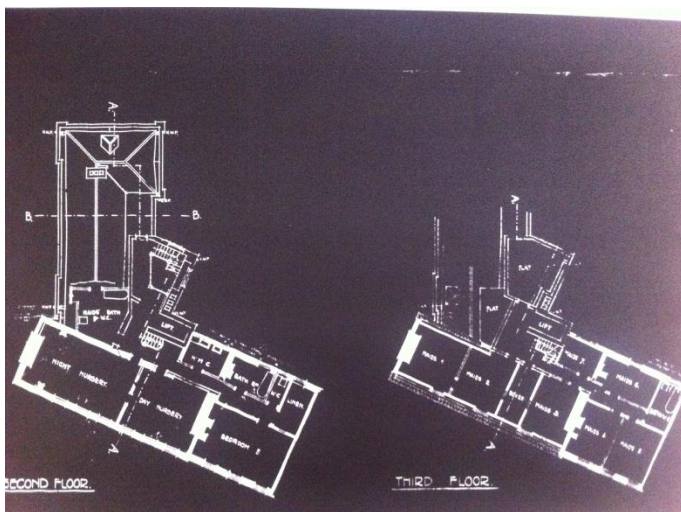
Second and third floor plan, Upper Terrace Lodge, 1920.
